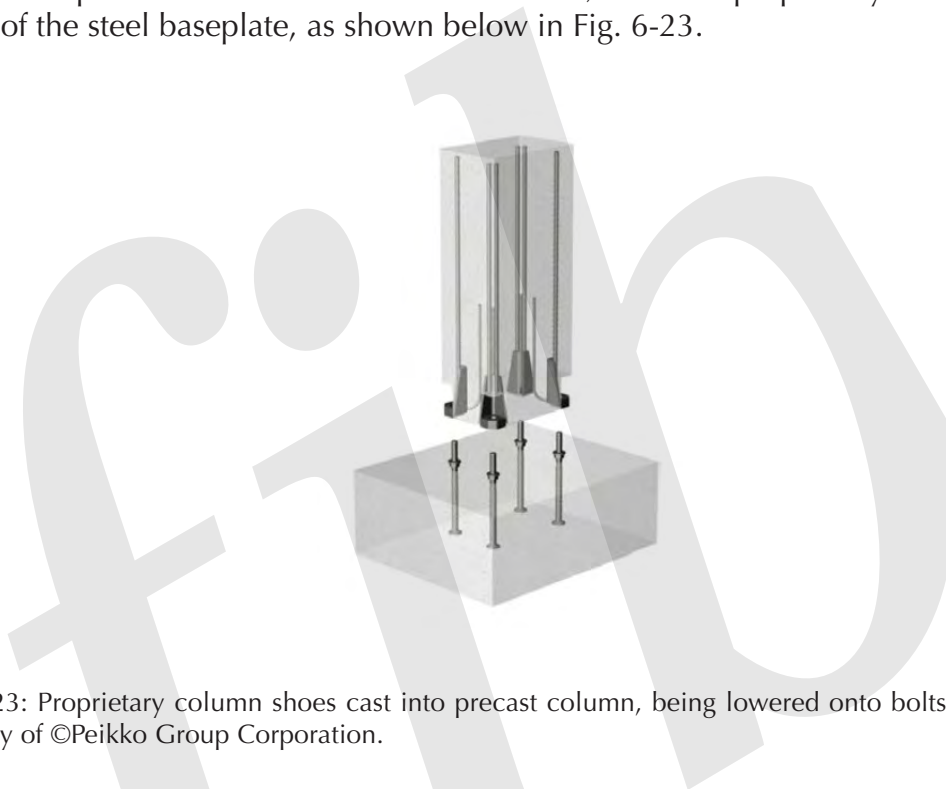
Proprietary column shoes cast into precast column, being lowered onto bolts cast into base, courtesy of ©Peikko Group Corporation.
